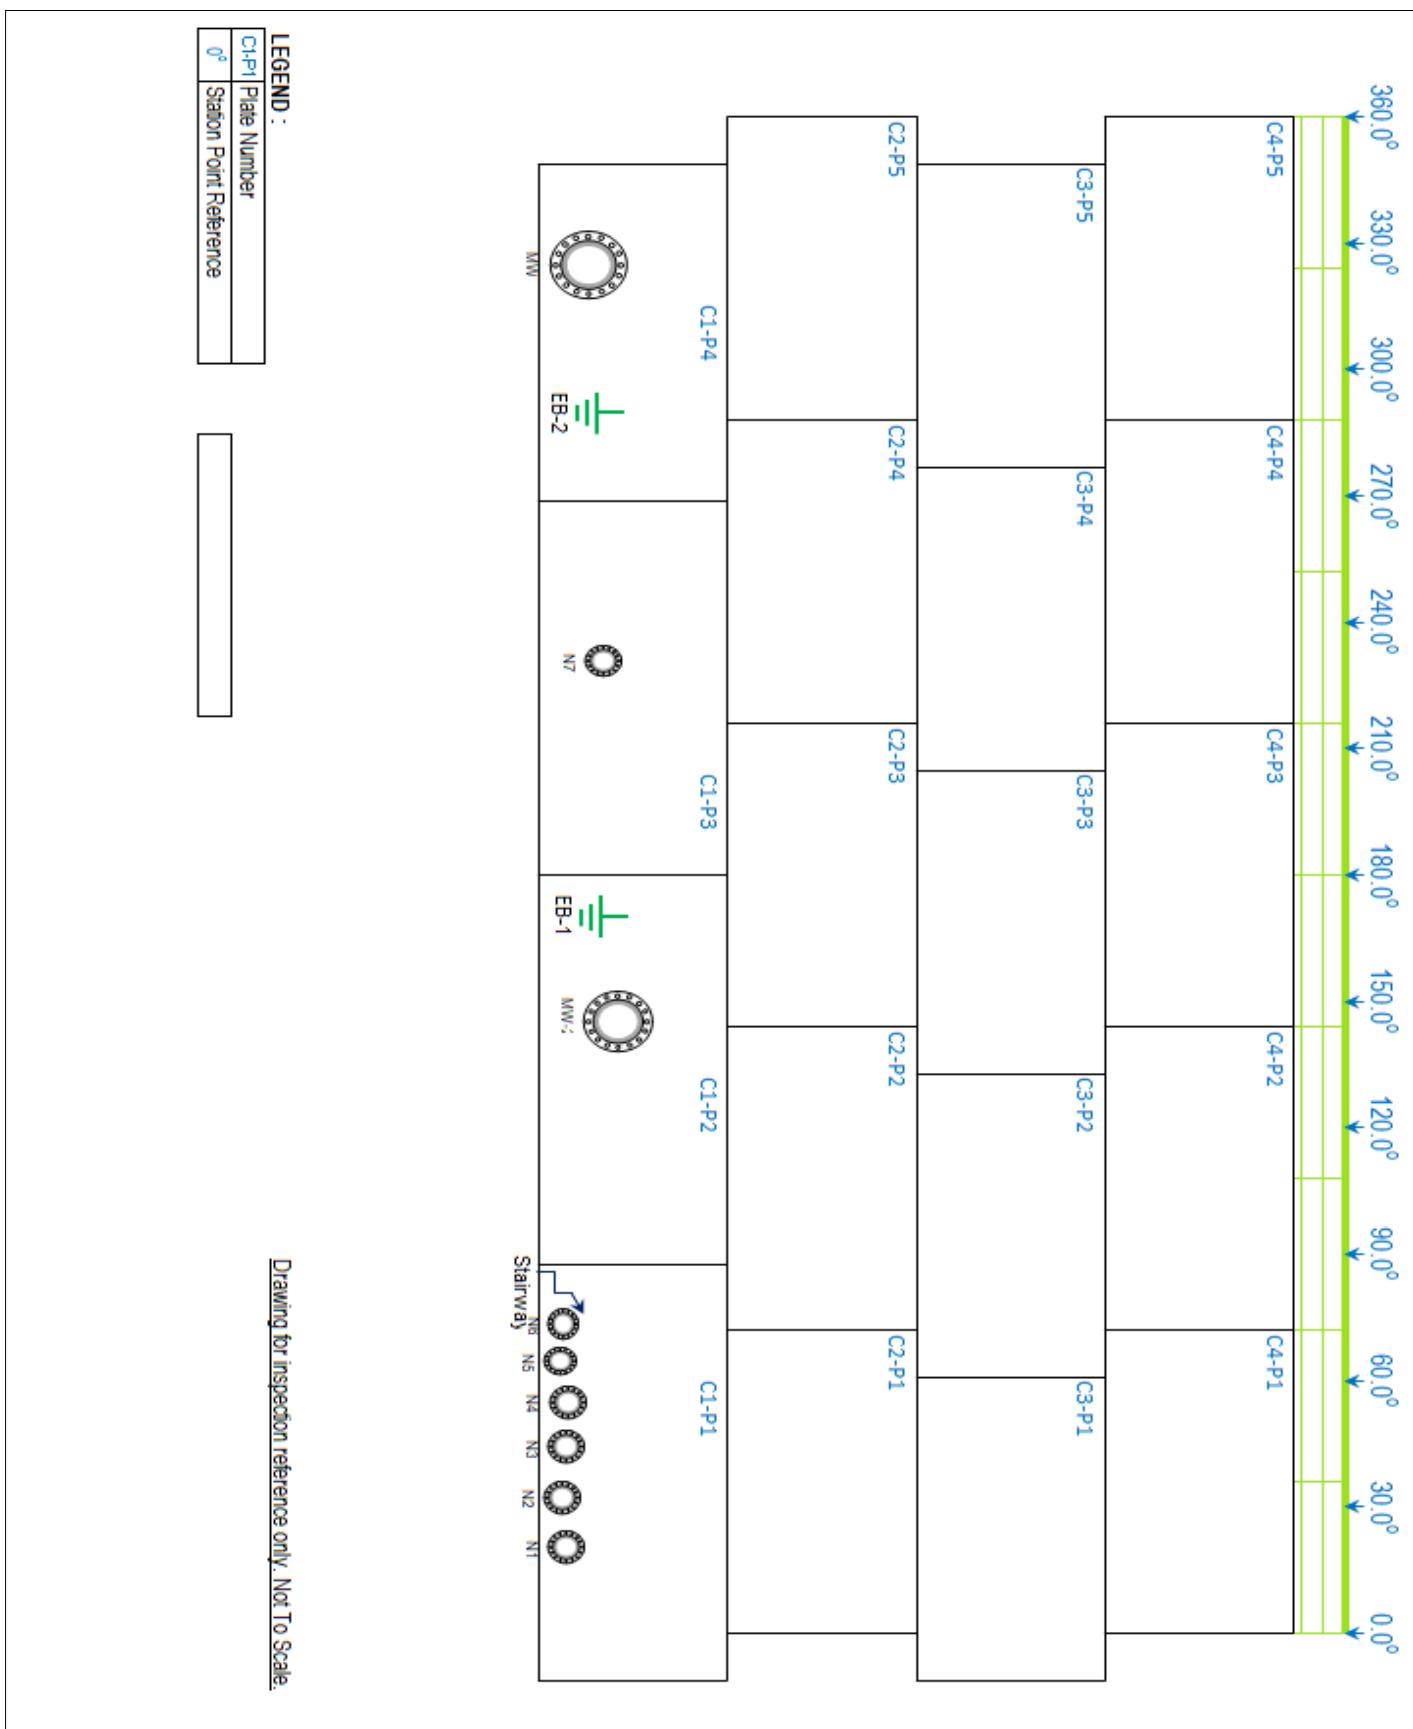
Tank Shell Plate and Nozzle Layout
